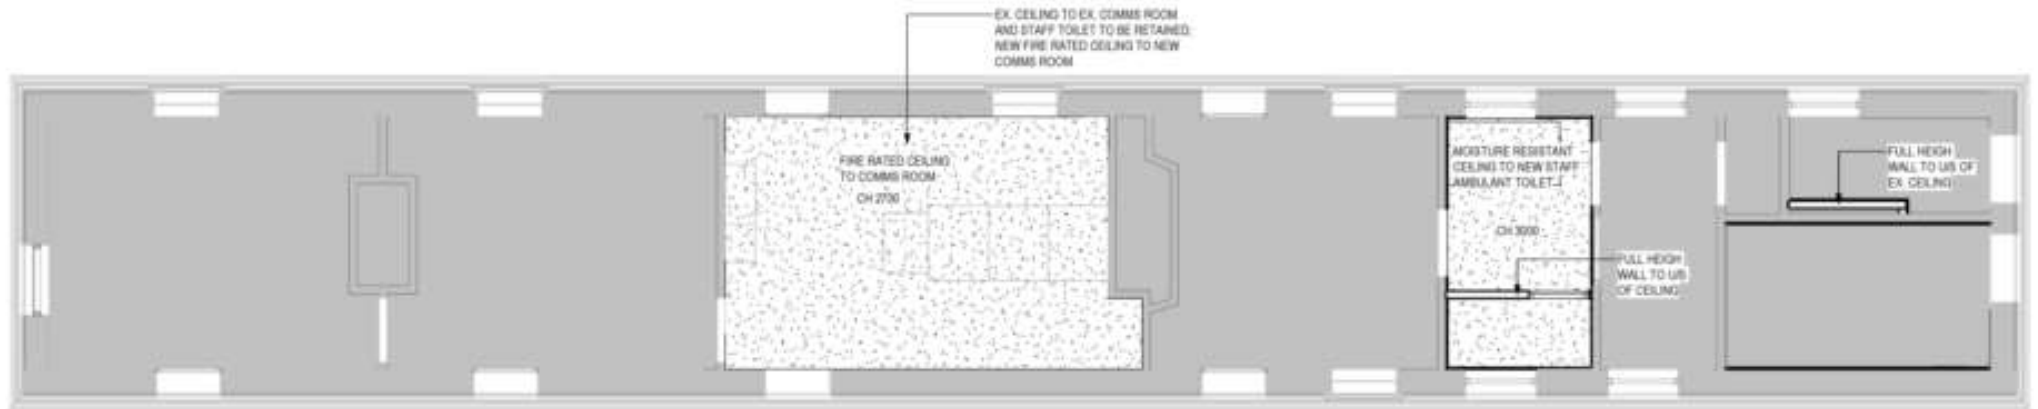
Detail of Works proposed to the interior of the Island Platform building. (Source: Transport for NSW)
